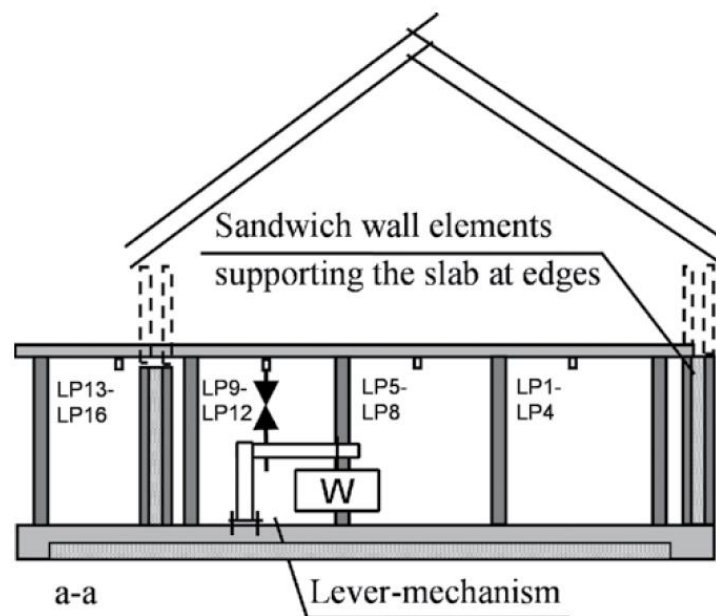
Construction of the roof structure and upper level sandwich walls took place during the long-term period. From Hedebratt & Silfwerbrand (2015).
